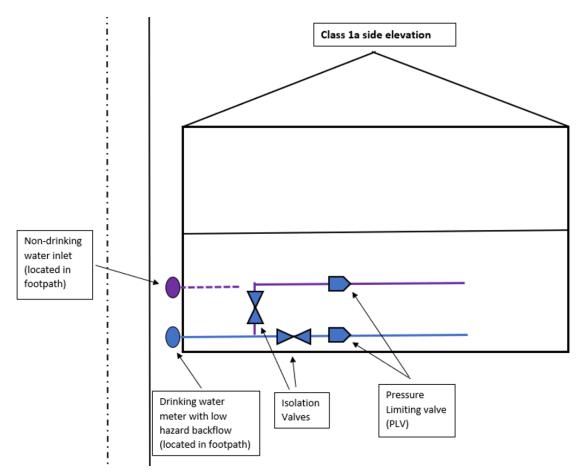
Connection between non-drinking water and drinking water services in secondary alternative location.
